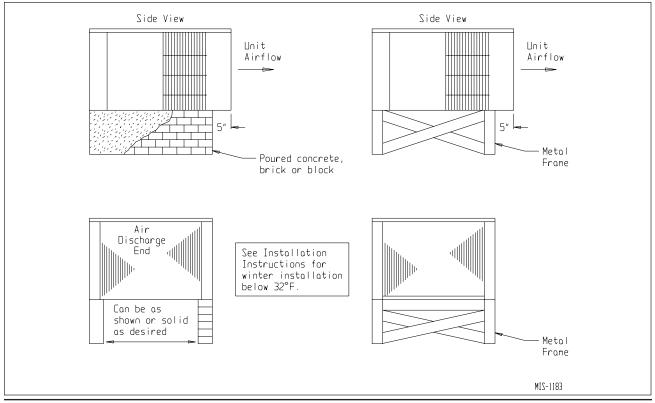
ELEVATED MOUNTING PLATFORMS
